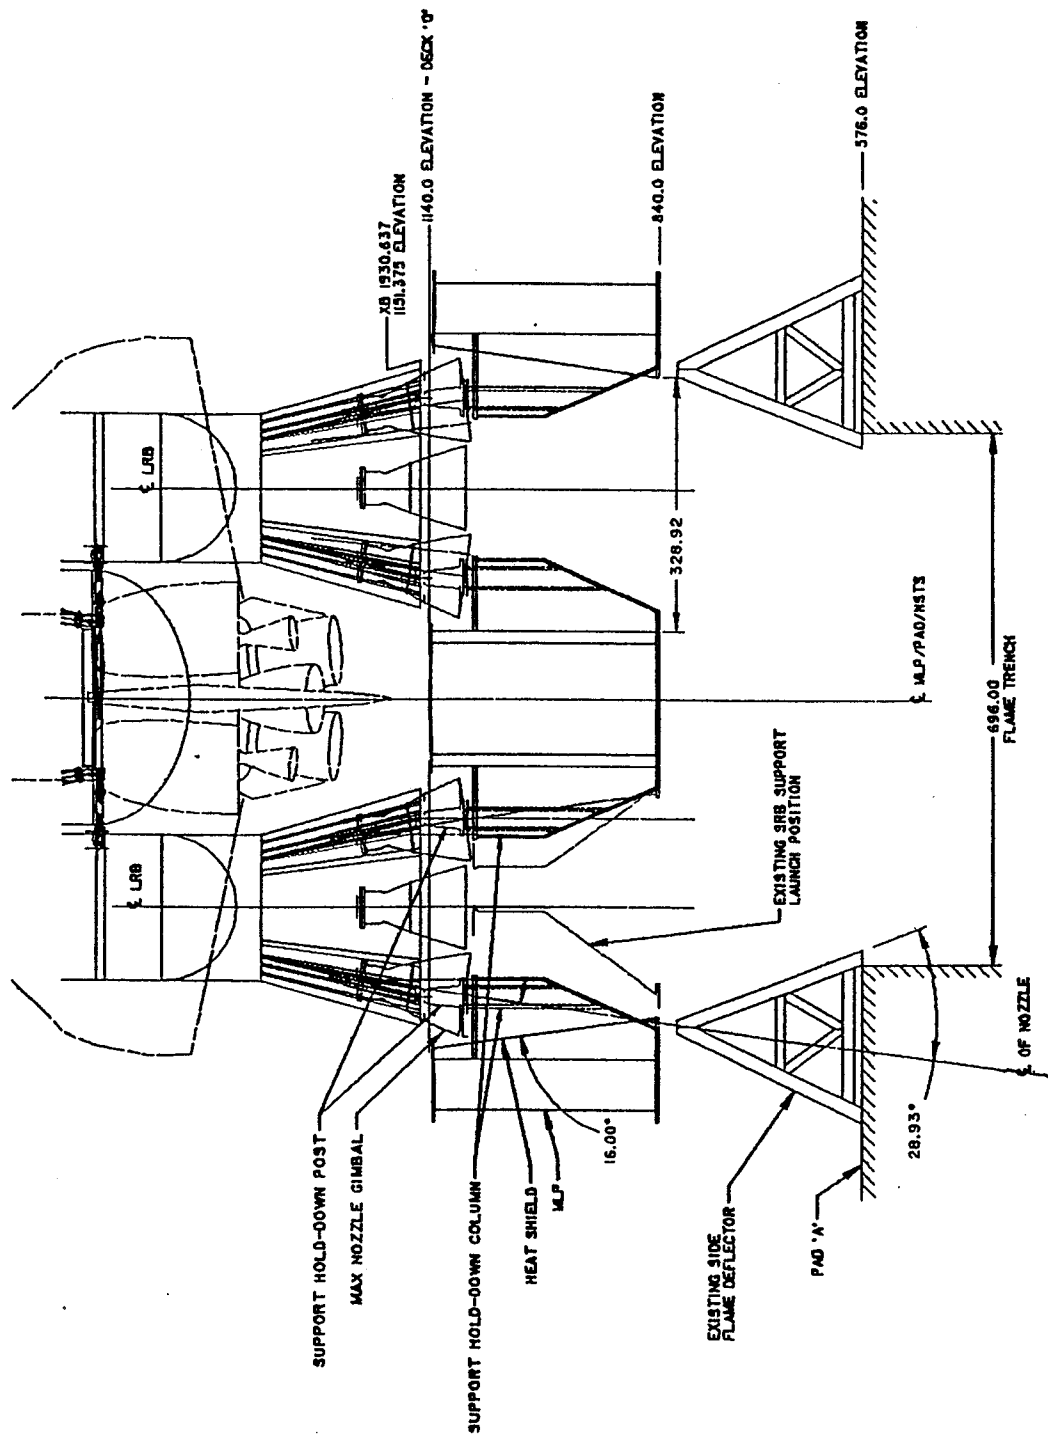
Heat Shielding on the Outer Exhaust Hole Edges
